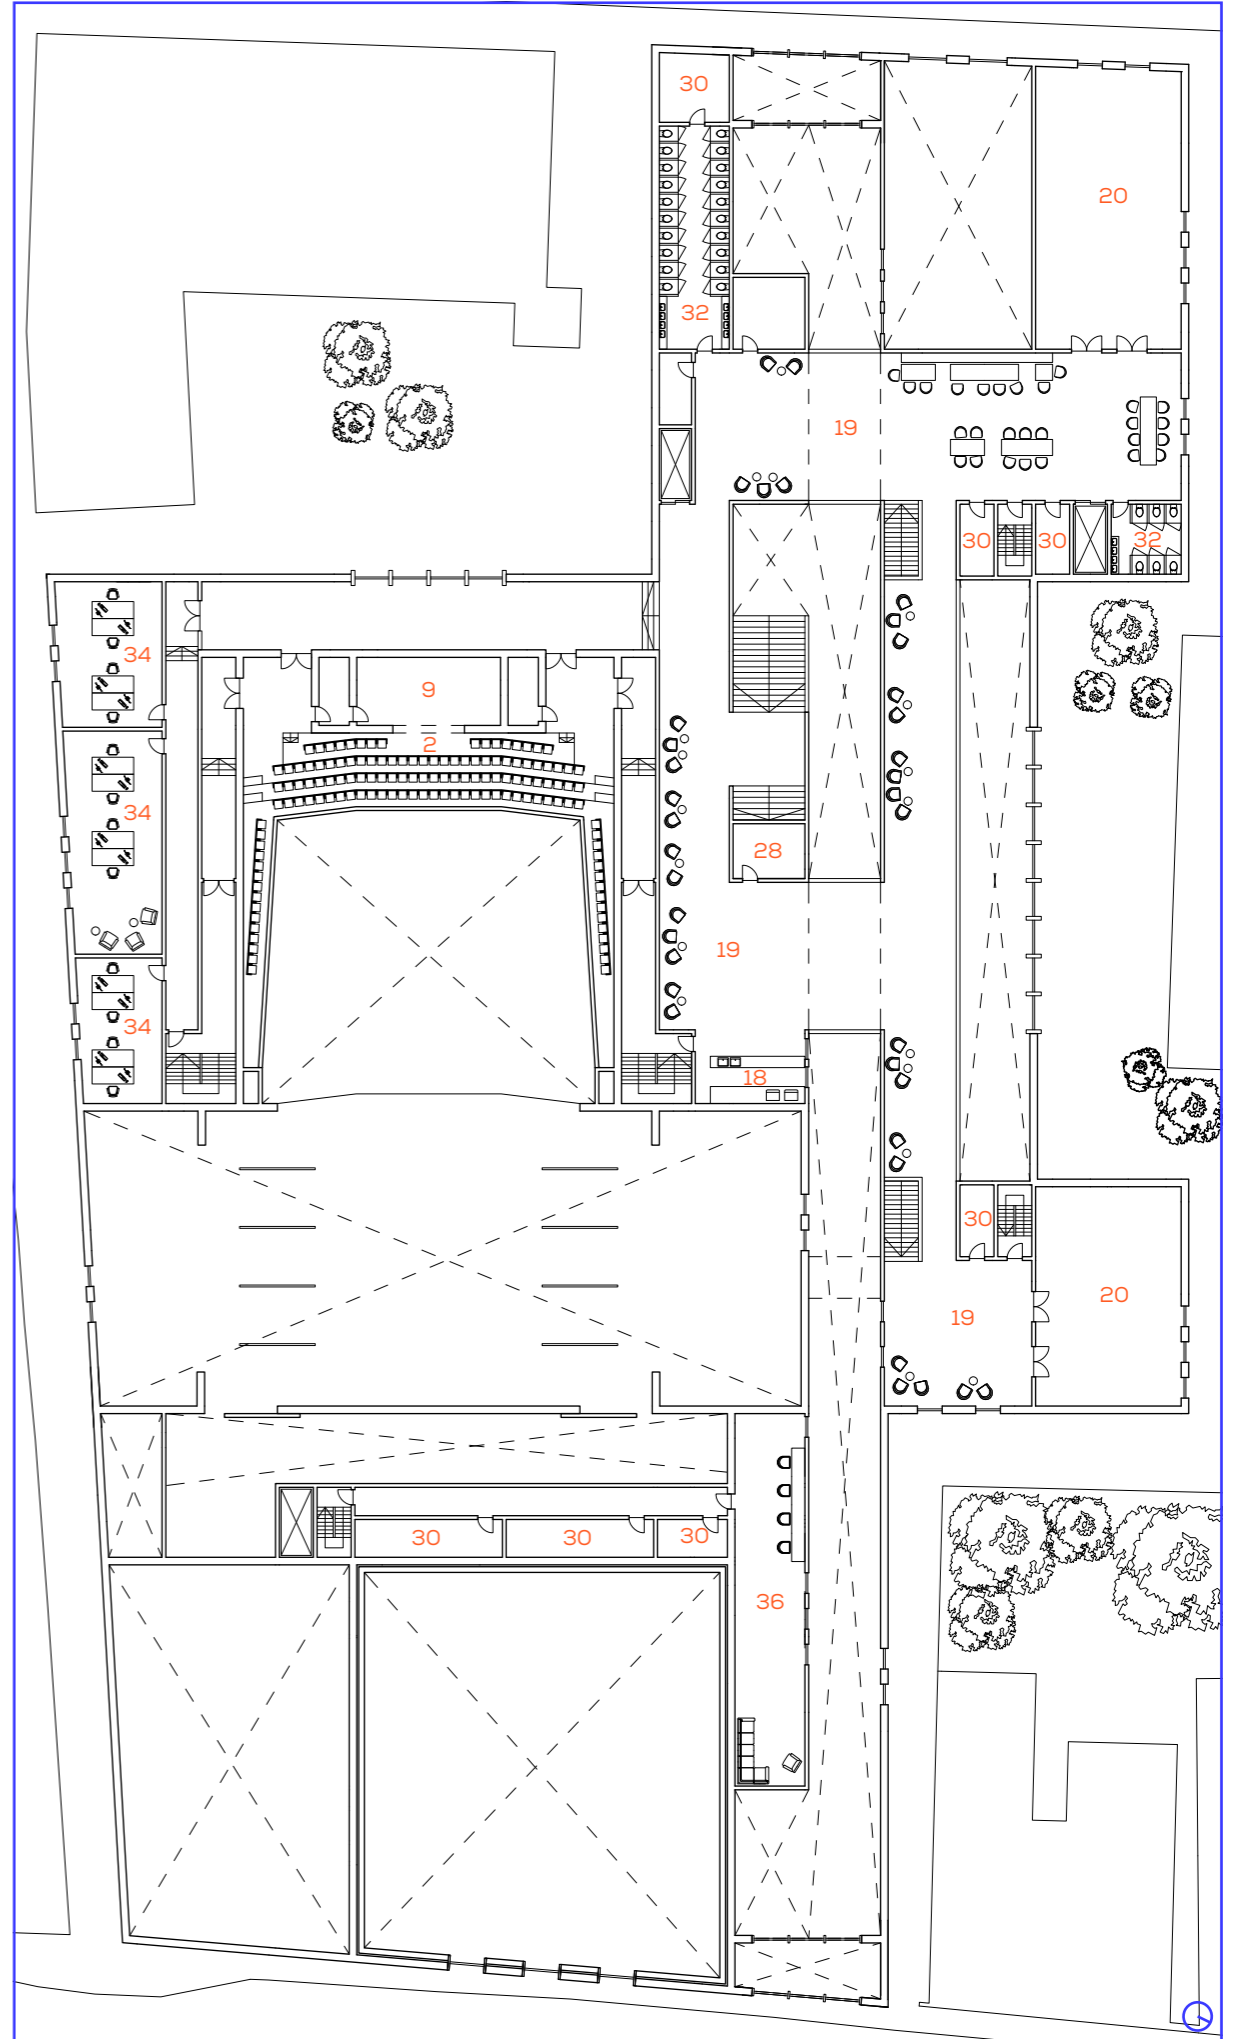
Floorplan second floor drawn on scale 1:200, scaled to 1:400
